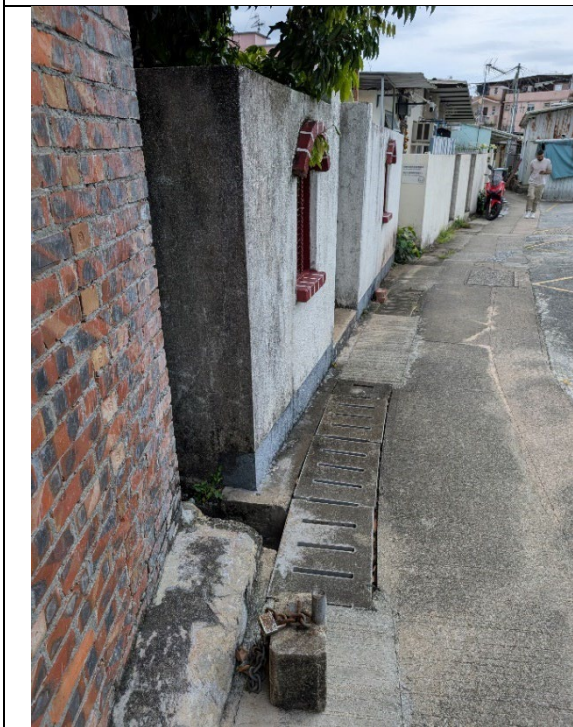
Existing 375mm channel at the downstream of the northeast corner of the Application Site flowing to the north.
